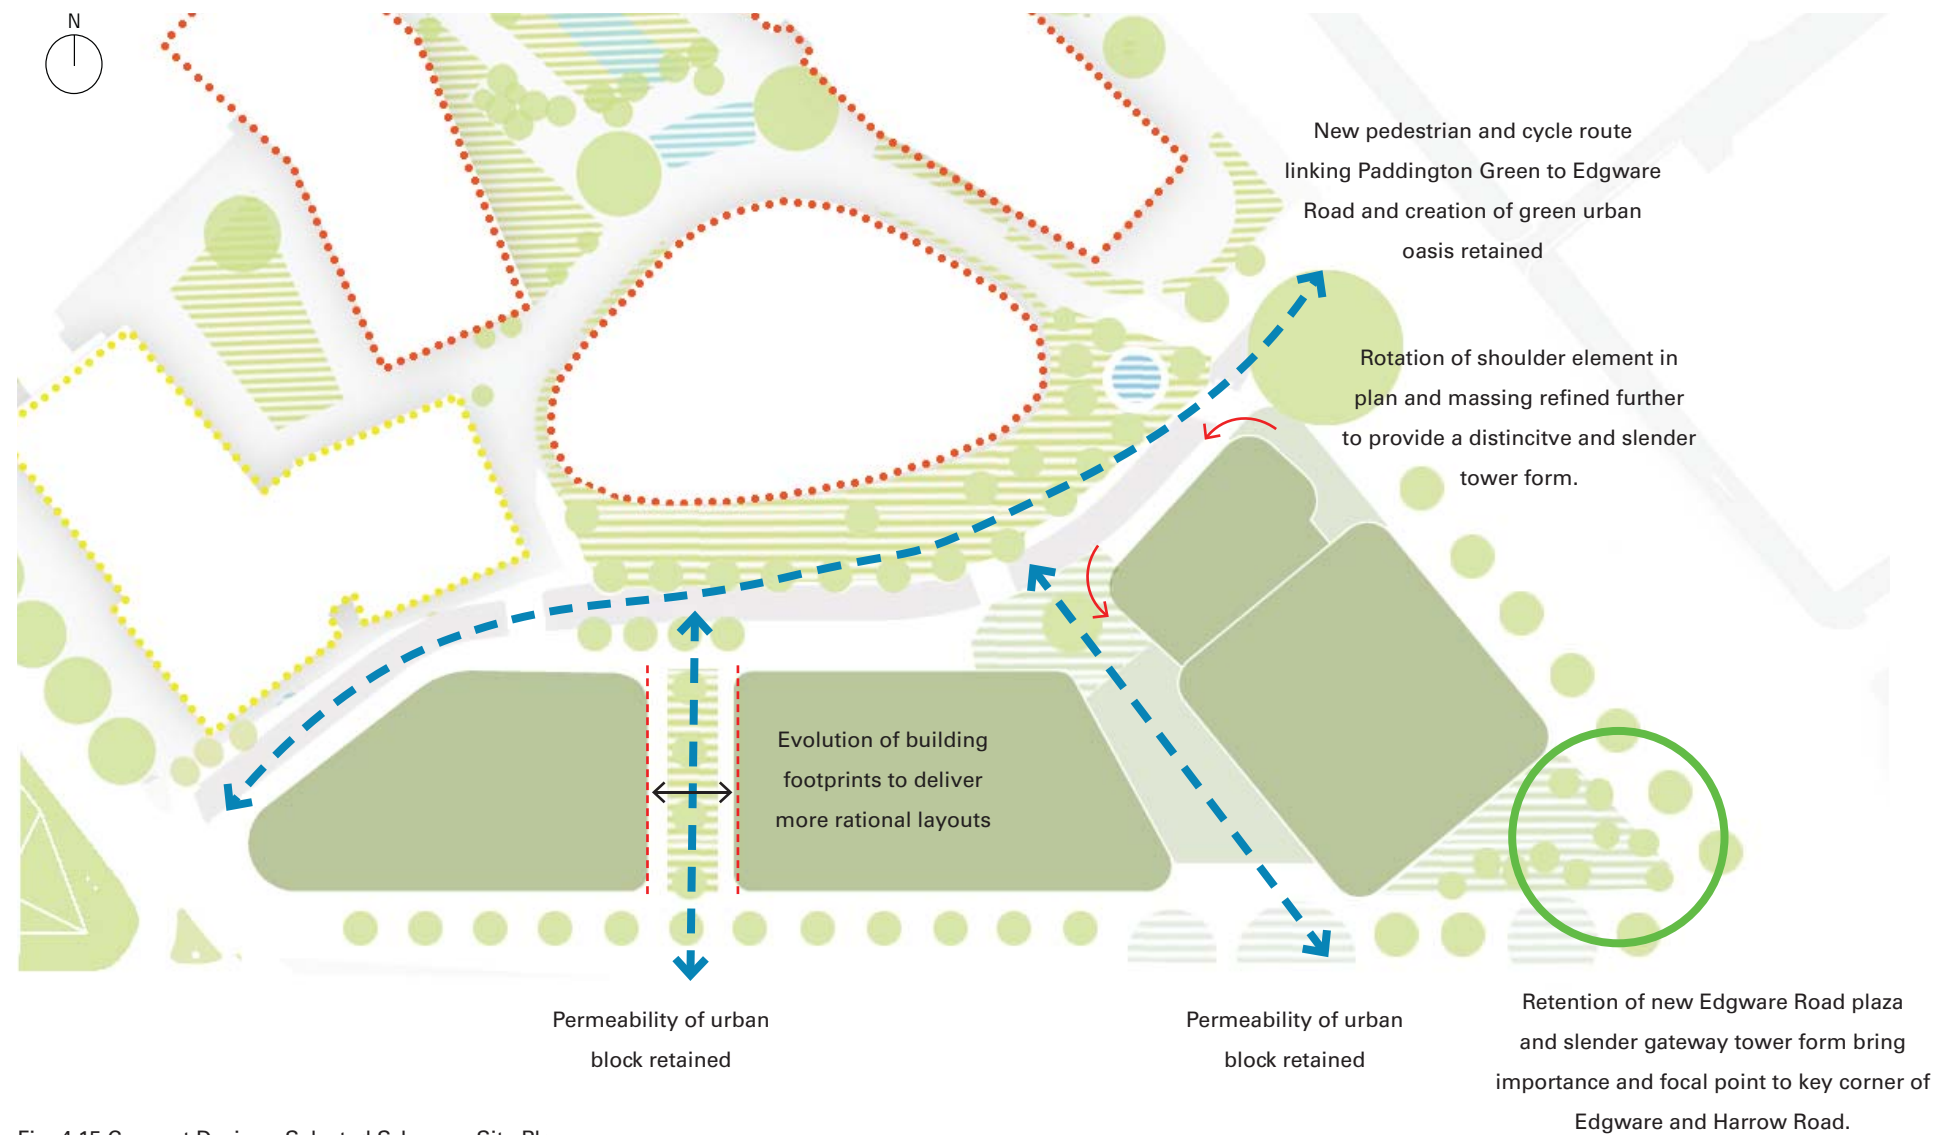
Concept Design - Selected Scheme - Site Plan
